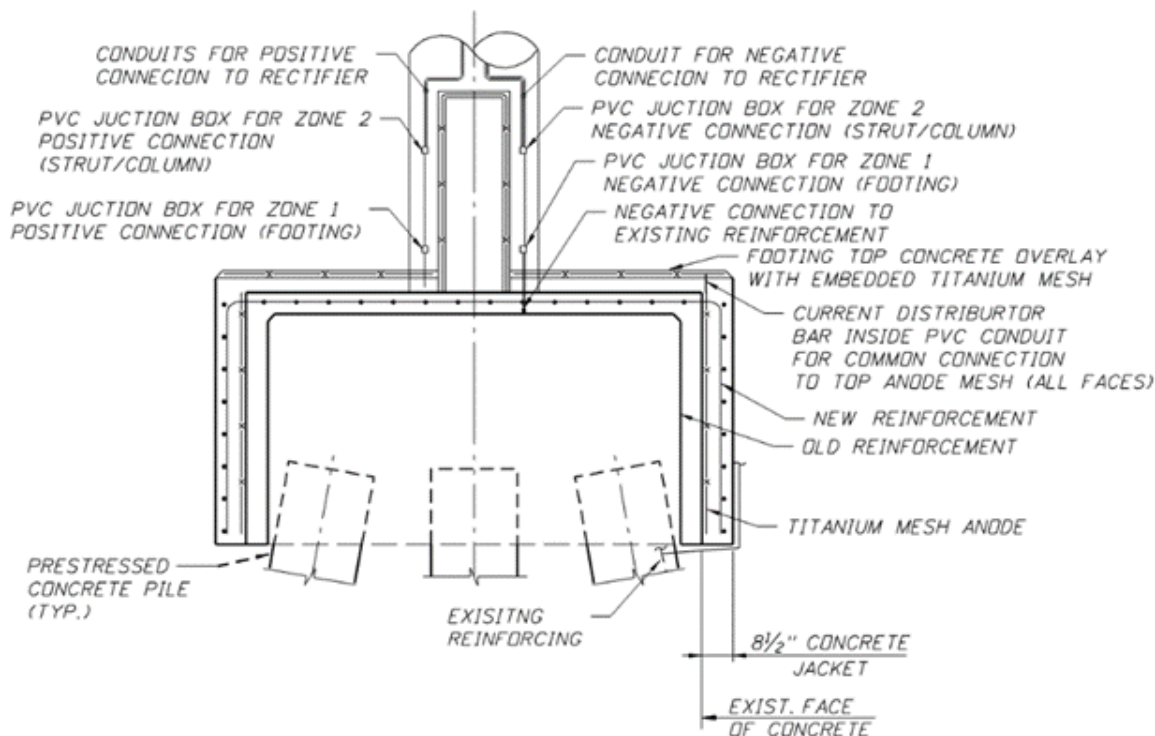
Cross-sectional view of pier footing ICCP system from Drawing Set from Financial Project ID 420666-1-52-01 (2009 Installation).
